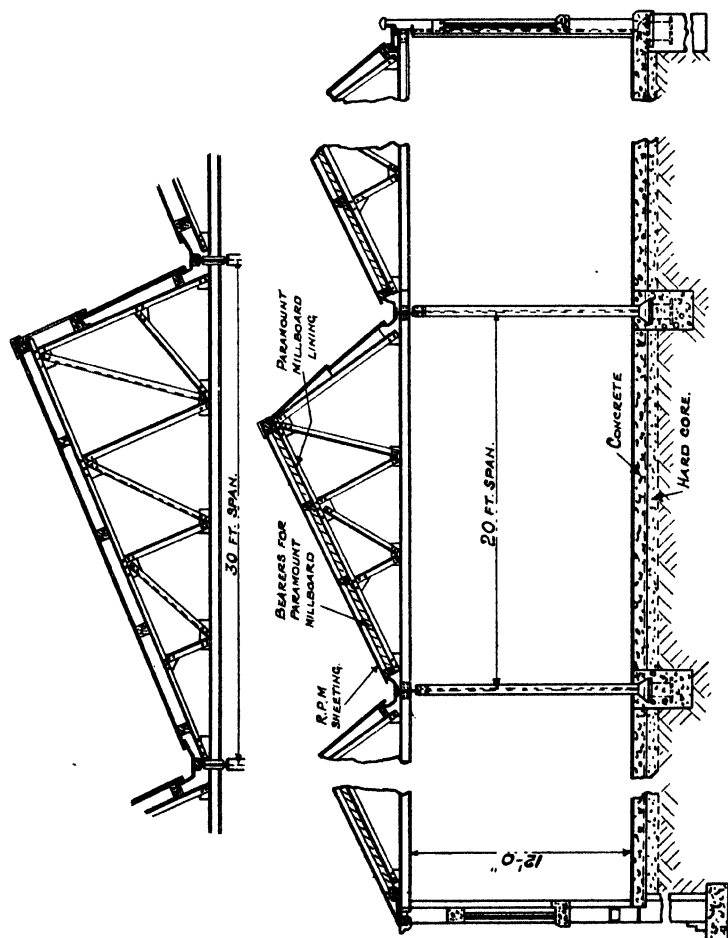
NORTH-LIGHT ROOF CONSTRUCTIONS
